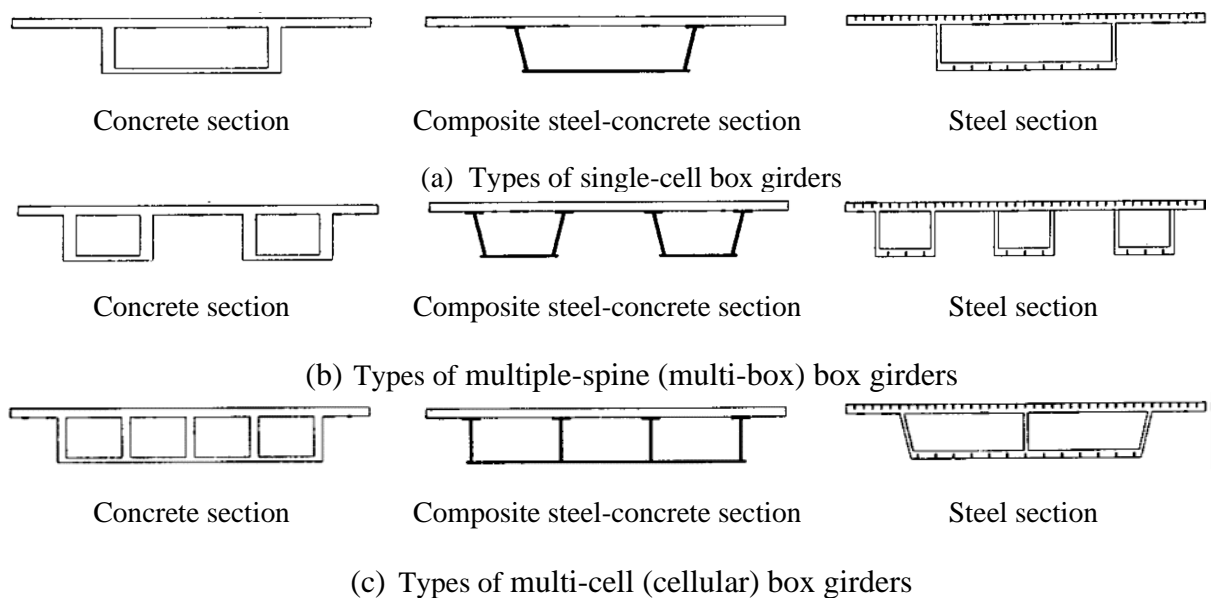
Box girder cross sections (Sennah and Kennedy, 2002)
